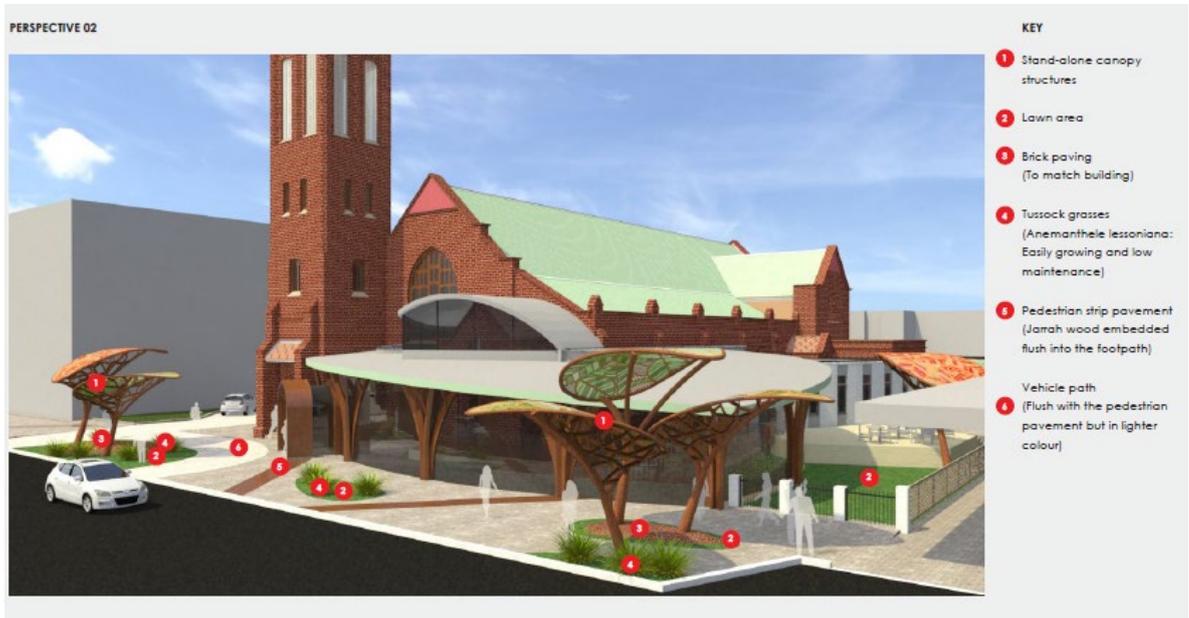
Plans of proposed works from Church Street (Excerpt from Appendix D of application)
